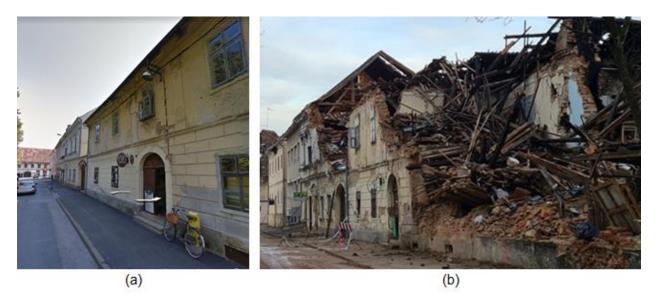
Collapsed URM buildings in downtown Petrinja (a) before the earthquake (source: Google Earth) and (b) after the earthquake (source: Nenad Bijelić).
